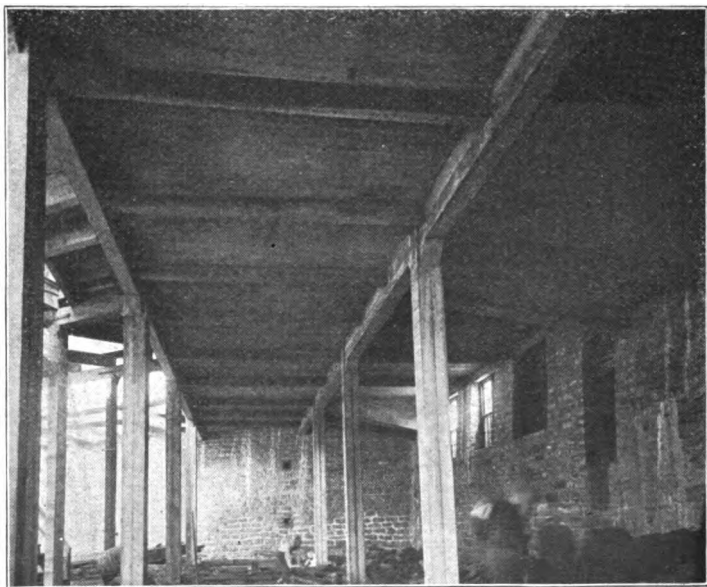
Floor of 20 ft. span, and Columns 26 feet high.
